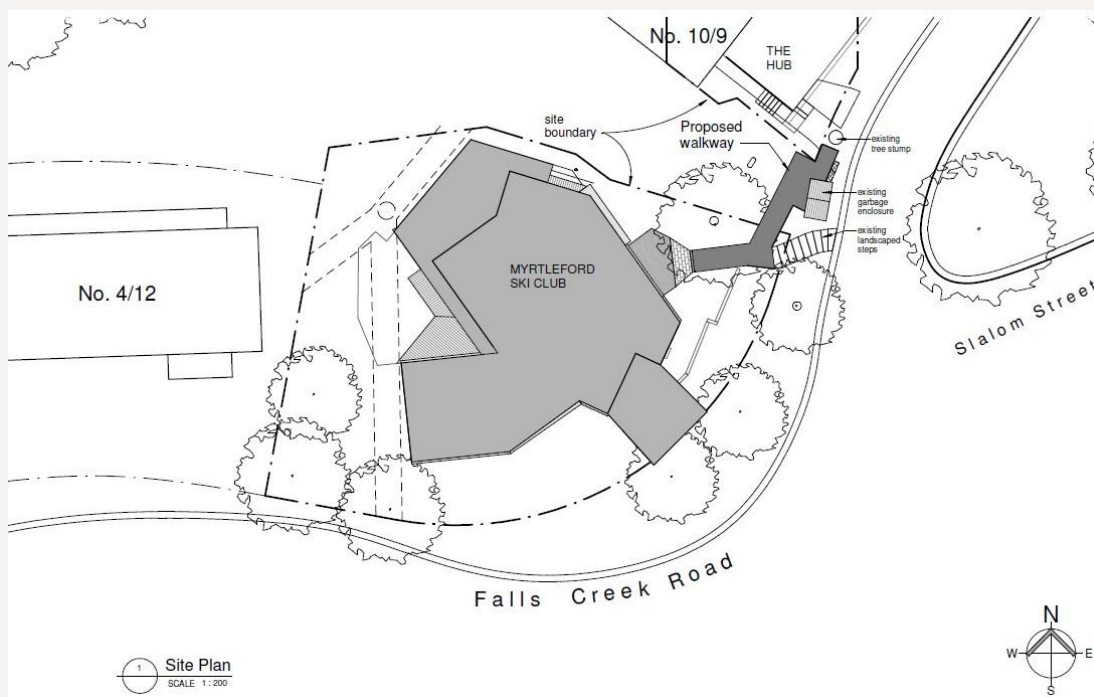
| Proposed Site Plan (Source: Sunjoule Design 2024)
